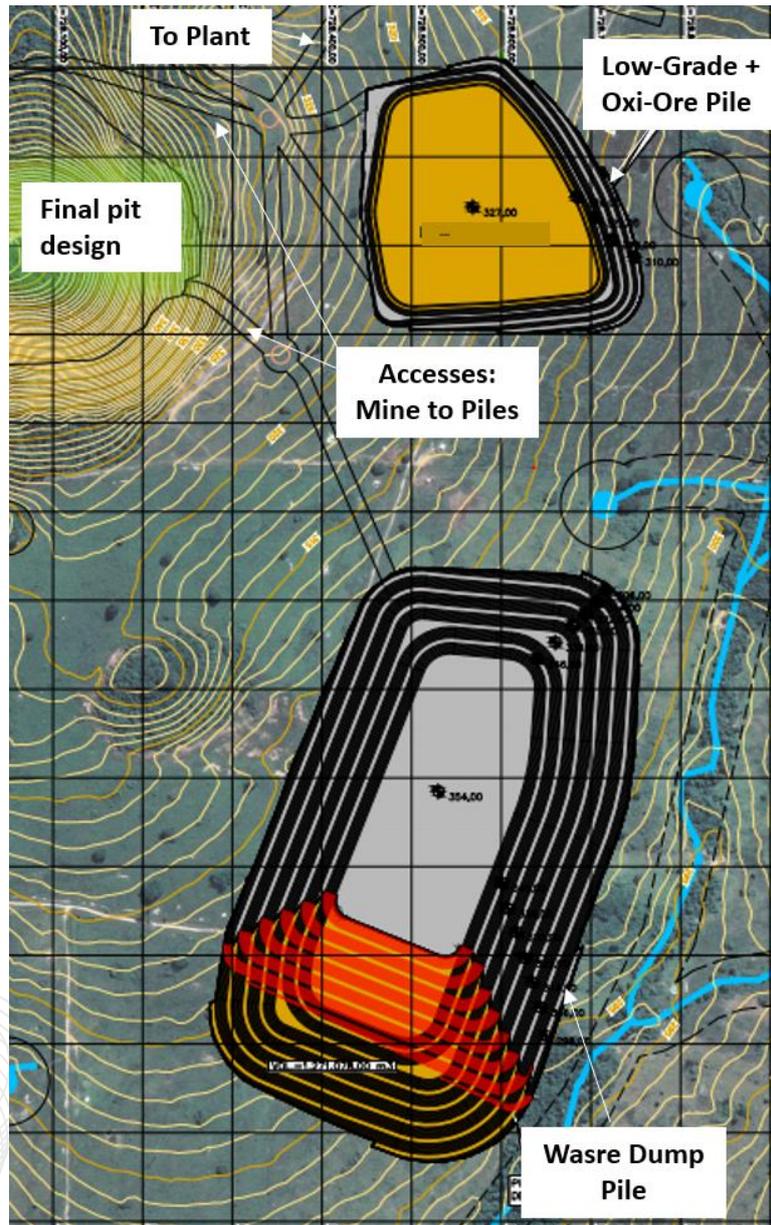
Details of the Final Designed Plans for: Waste Dump Piles, Oxidized Ore and Low-Grade Ore Pile, and Mine Pit Design.
